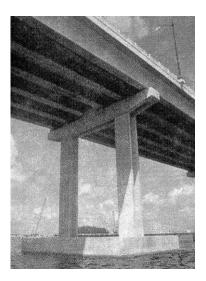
Precast Inverted-U Bent Caps on Precast I-Shaped Columns on Edison Bridge [1.25]
